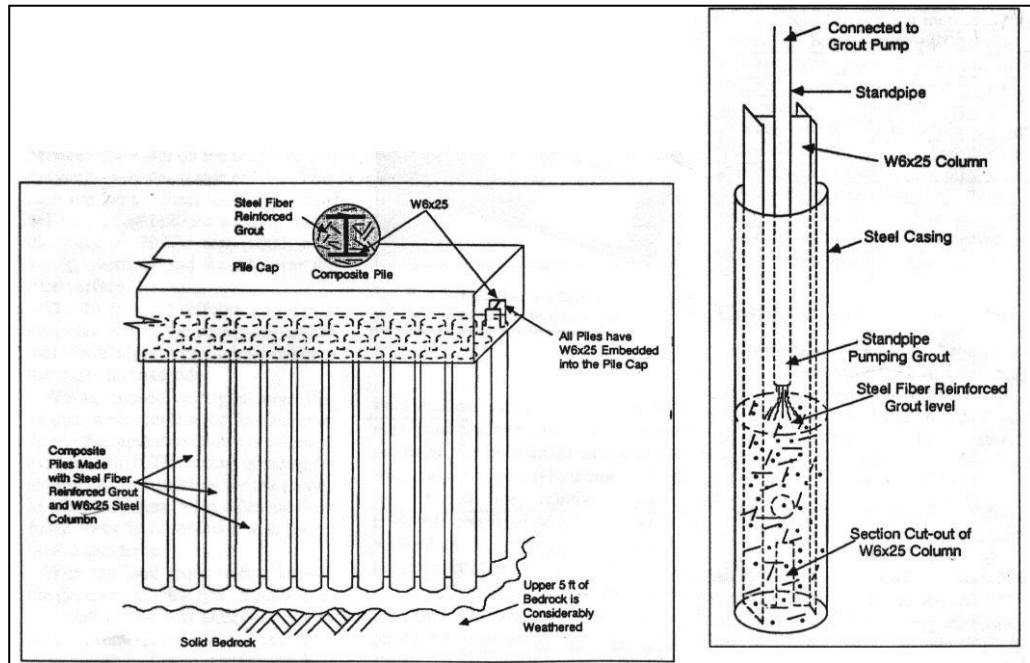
Piling arrangement and manufacturing procedure in Mesa Dam project (Bayasi & Downey, 1995)
